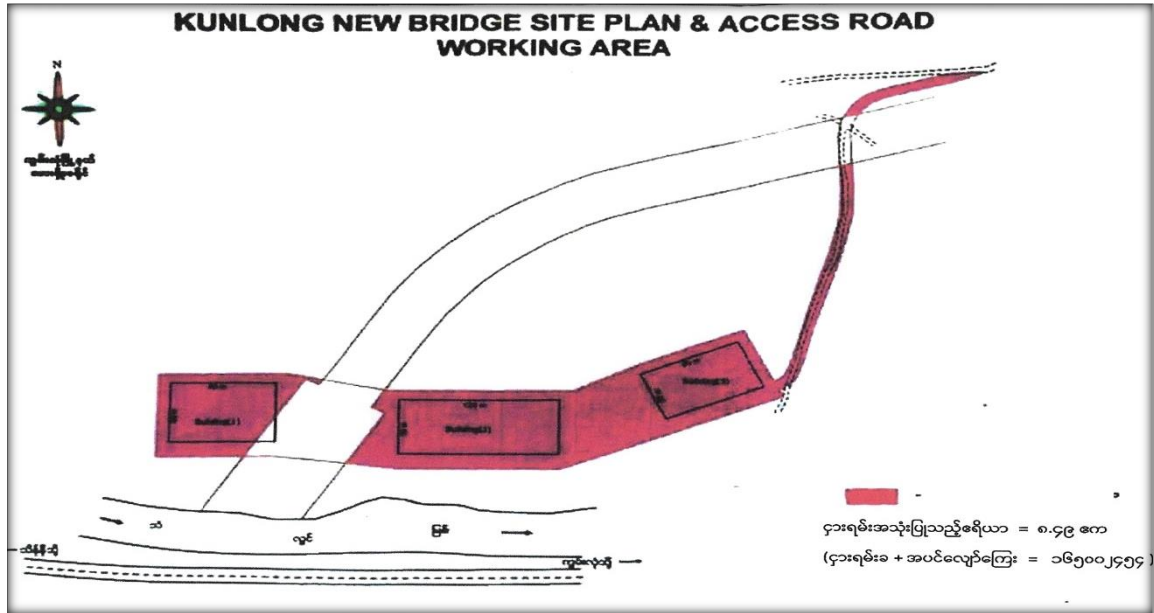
Location Map for the hired land in Kunlong new bridge site plan and access road working area
